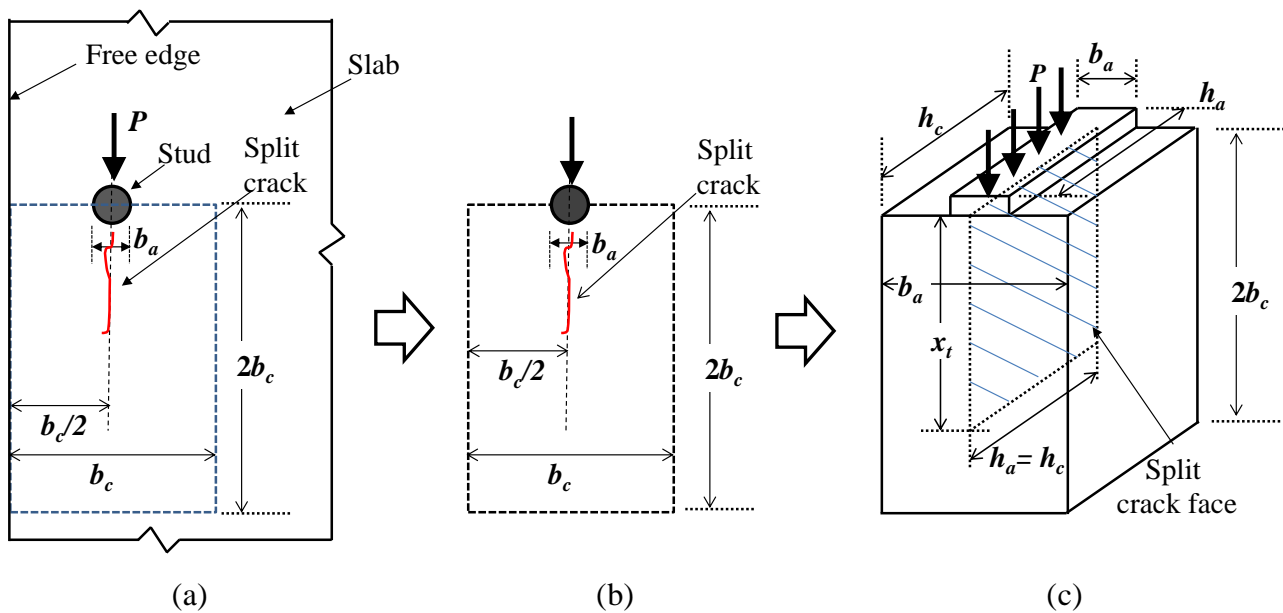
Modeling of split crack in slab caused by single shear stud: (a) prototype split crack problem; (b) effective region for split crack problem; (c) strip load local compression problem
